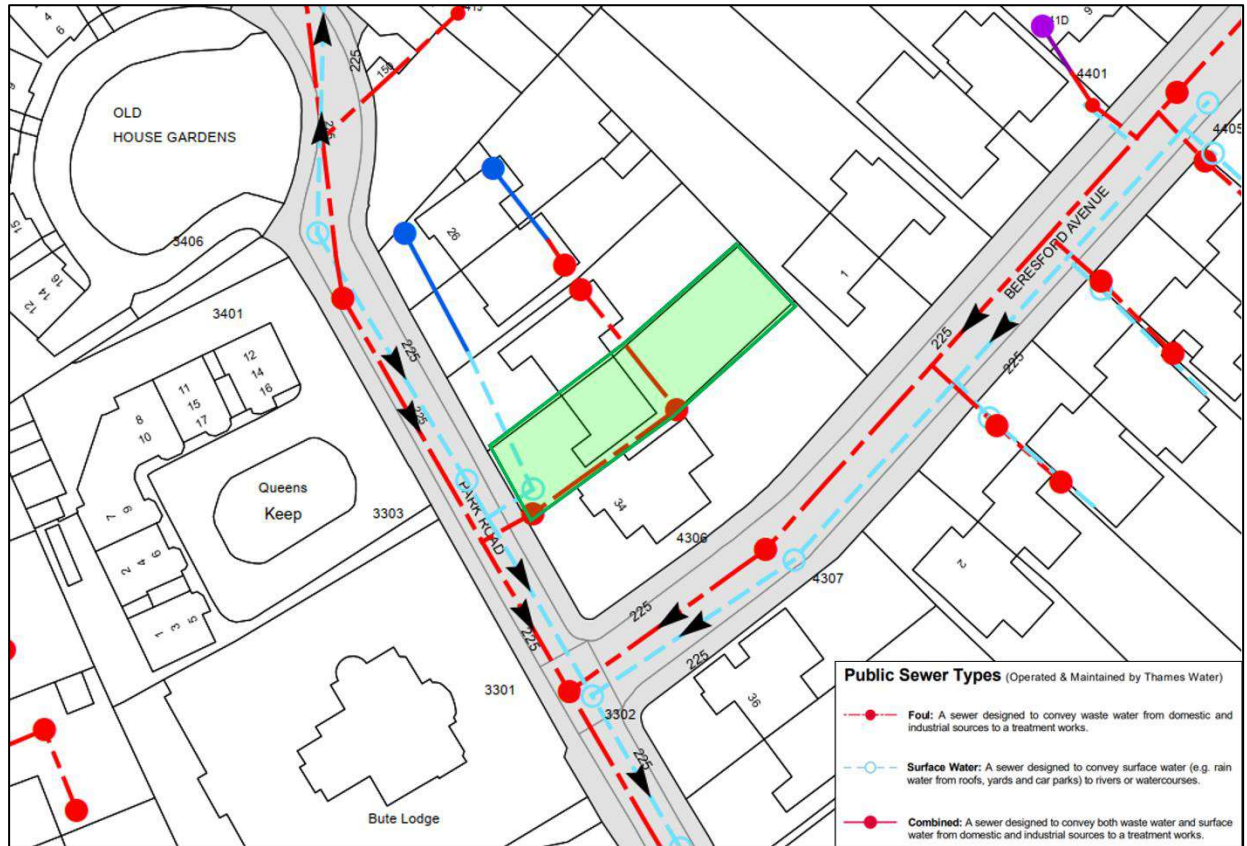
Thames Water Asset Plan Extract (refer to Appendix B)
